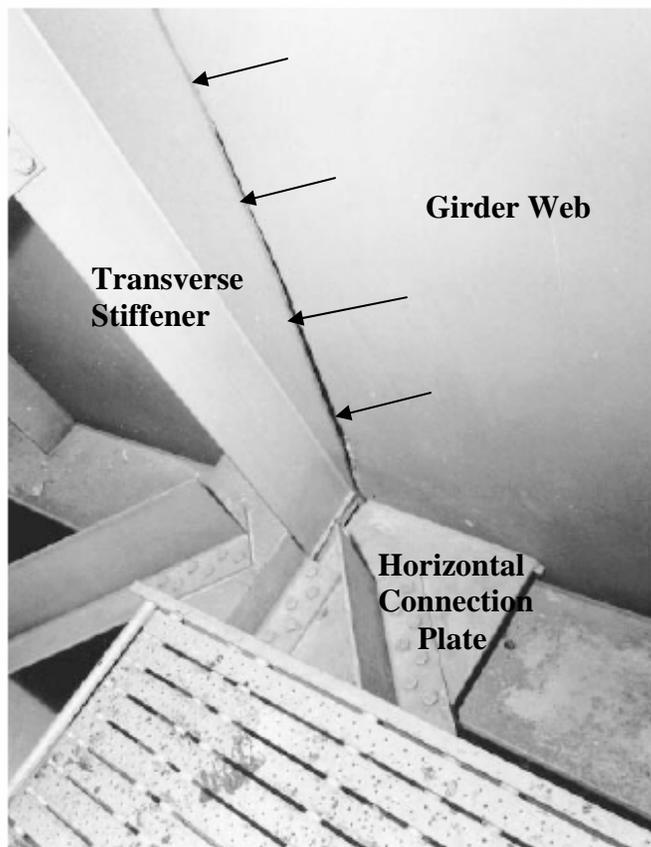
Cracked girder of Lafayette Street Bridge (Adapted from Fisher 1984)
